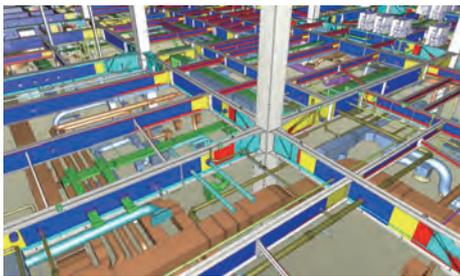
Fixing of ceiling inside equipment and coordination of steel-frame sleeves
